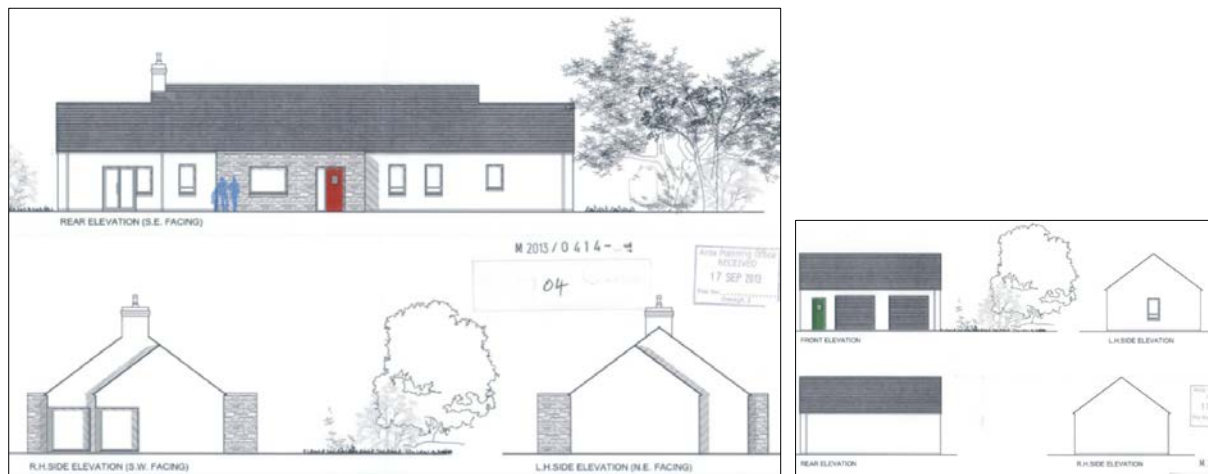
Elevations of dwelling and garage approved under M/2013/0414/F
